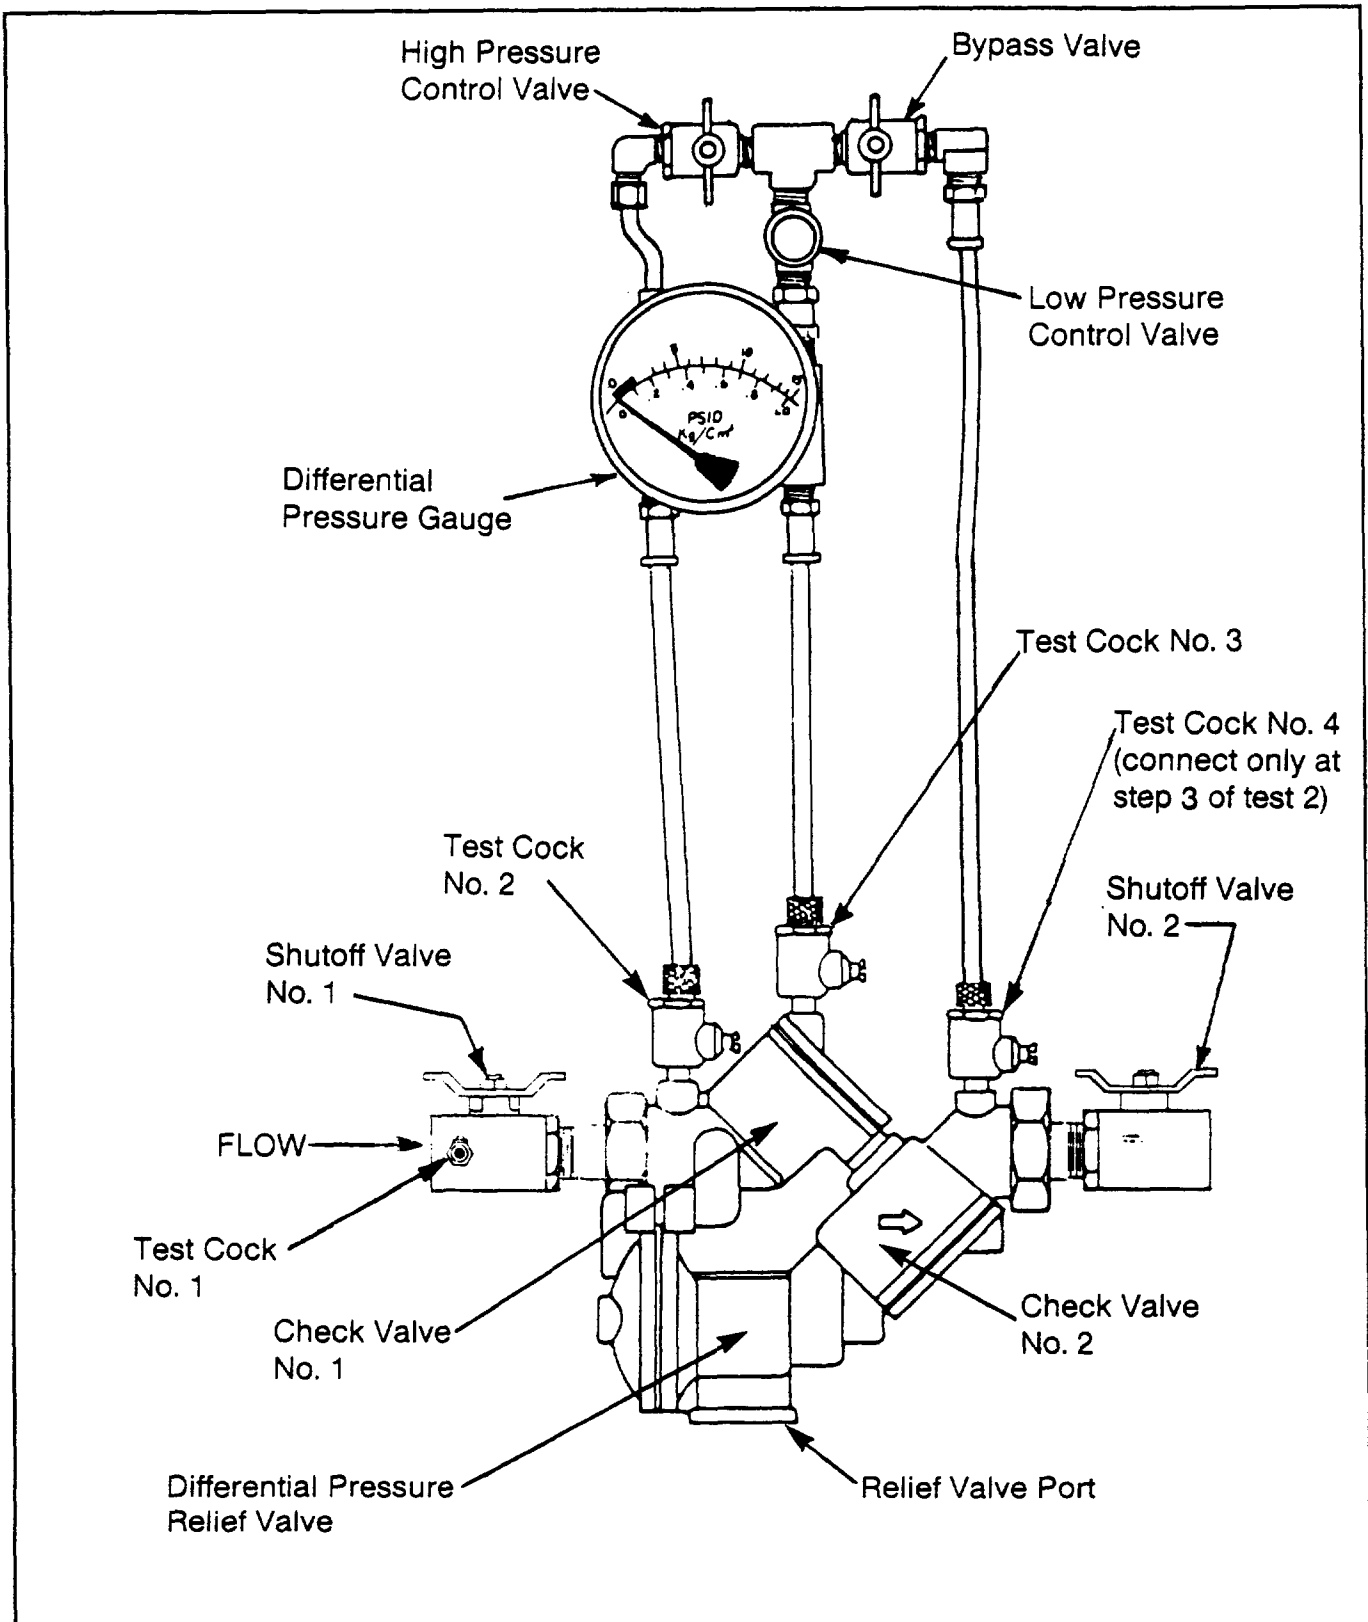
Setup For Testing Reduced Pressure Backflow Assembly Using Differential Pressure Gauge.
